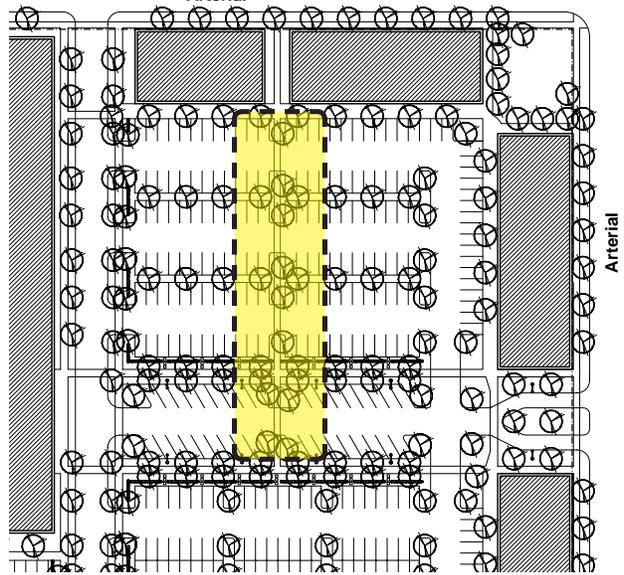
D.8: Site diagram illustrating a parking area walkway perpendicular to the parking drive aisles. The walkway extends 3 parking modules and crosses a primary internal drive.
